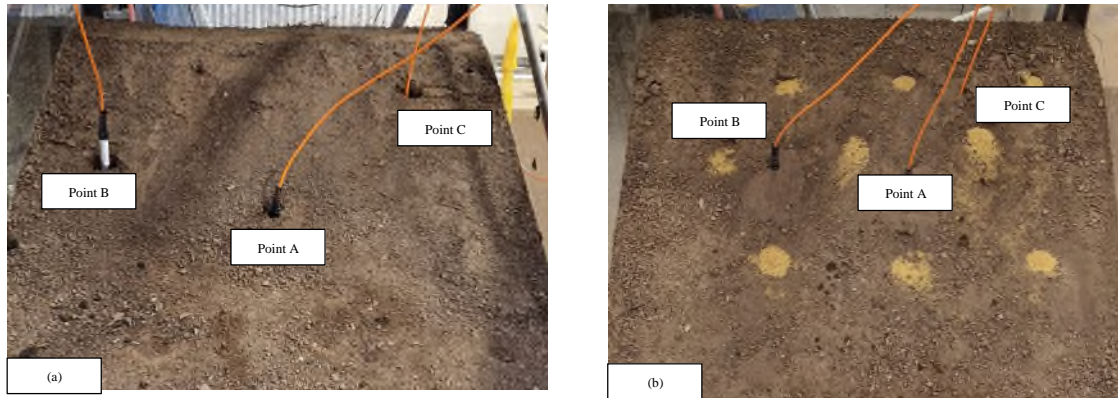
Piezometers Locations for both unreinforced and reinforced slope
